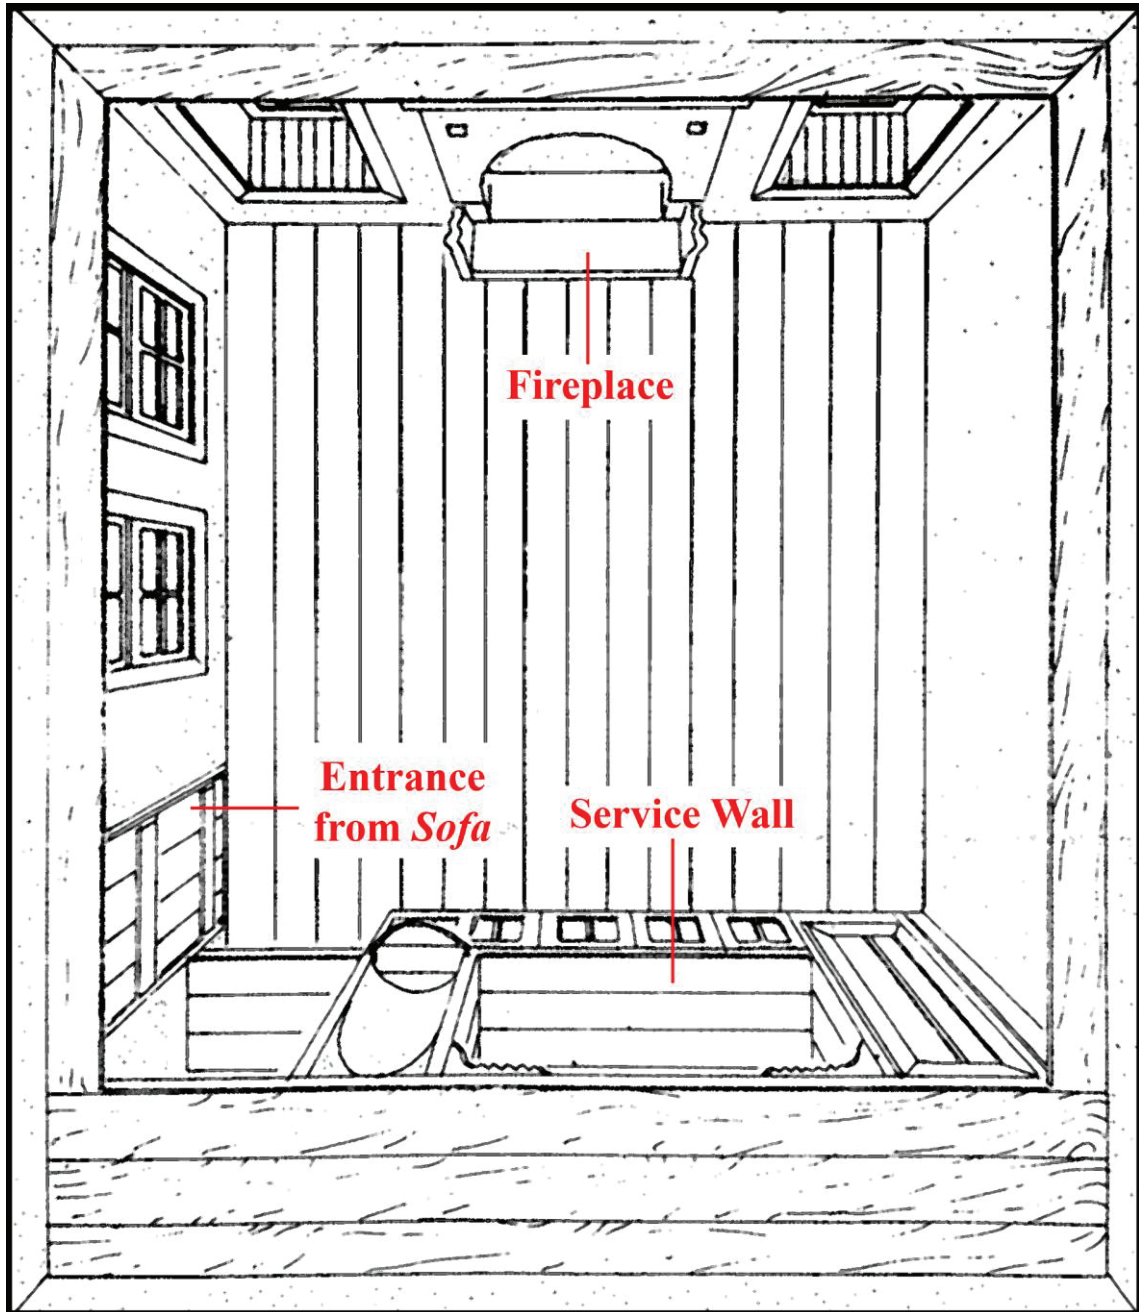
Plan perspective drawing of an example multi-functional room of a traditional Muğla house demonstrating the general layout of the space with architectural elements such as fireplace and multi-purpose service wall (Source: Aladağ, 1991).
